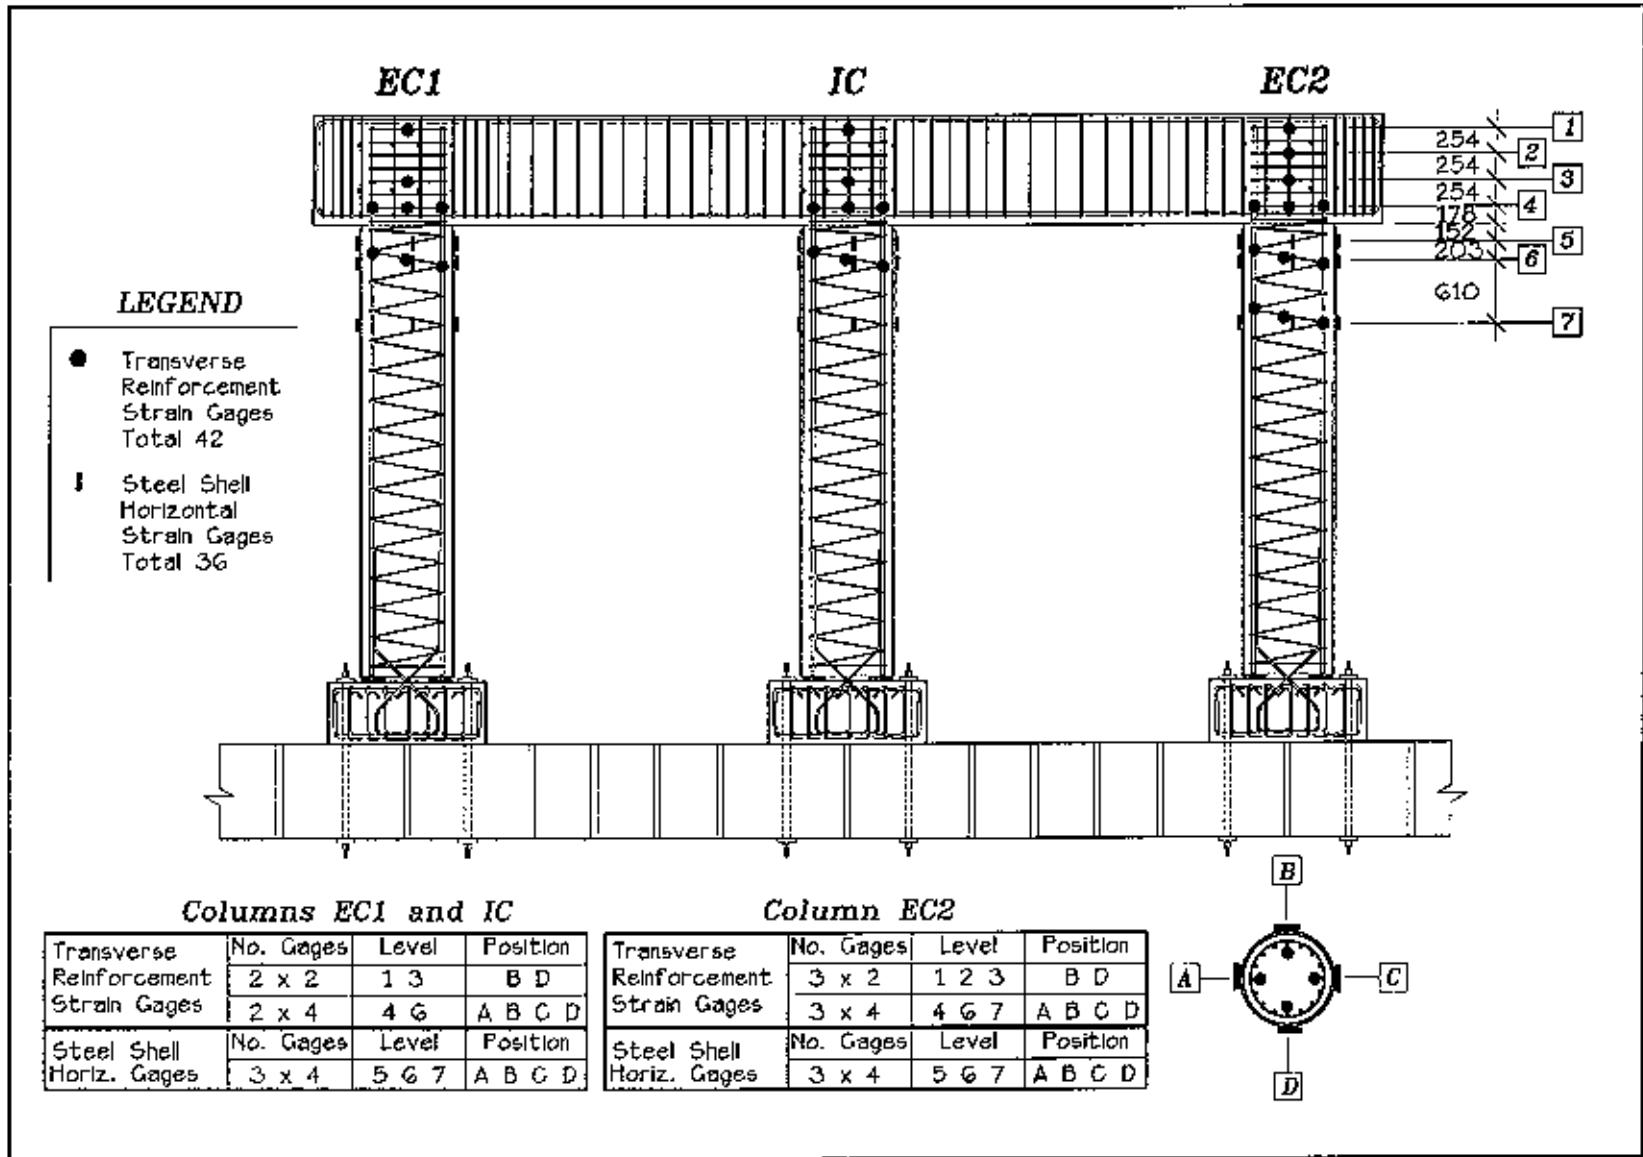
Steel Shell and Transverse Reinforcement Horizontal Strain Gage Layout
